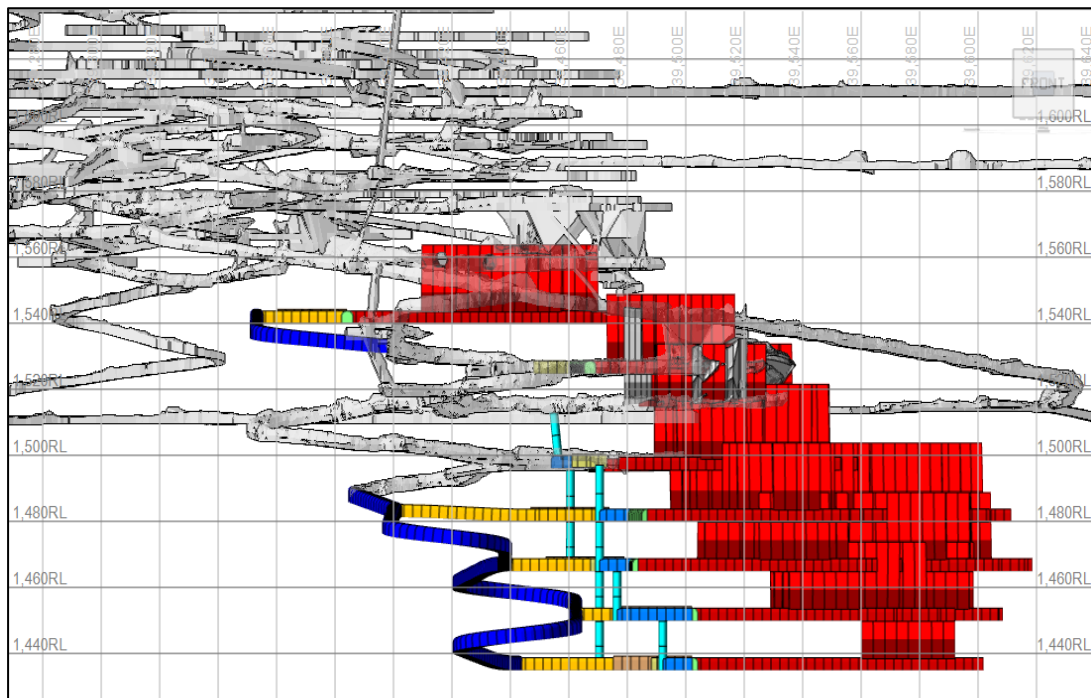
shows a cross section of the Ojuelas sublevel cave design and Figure 16-10 shows a long section of the Ojuelas cave design.
